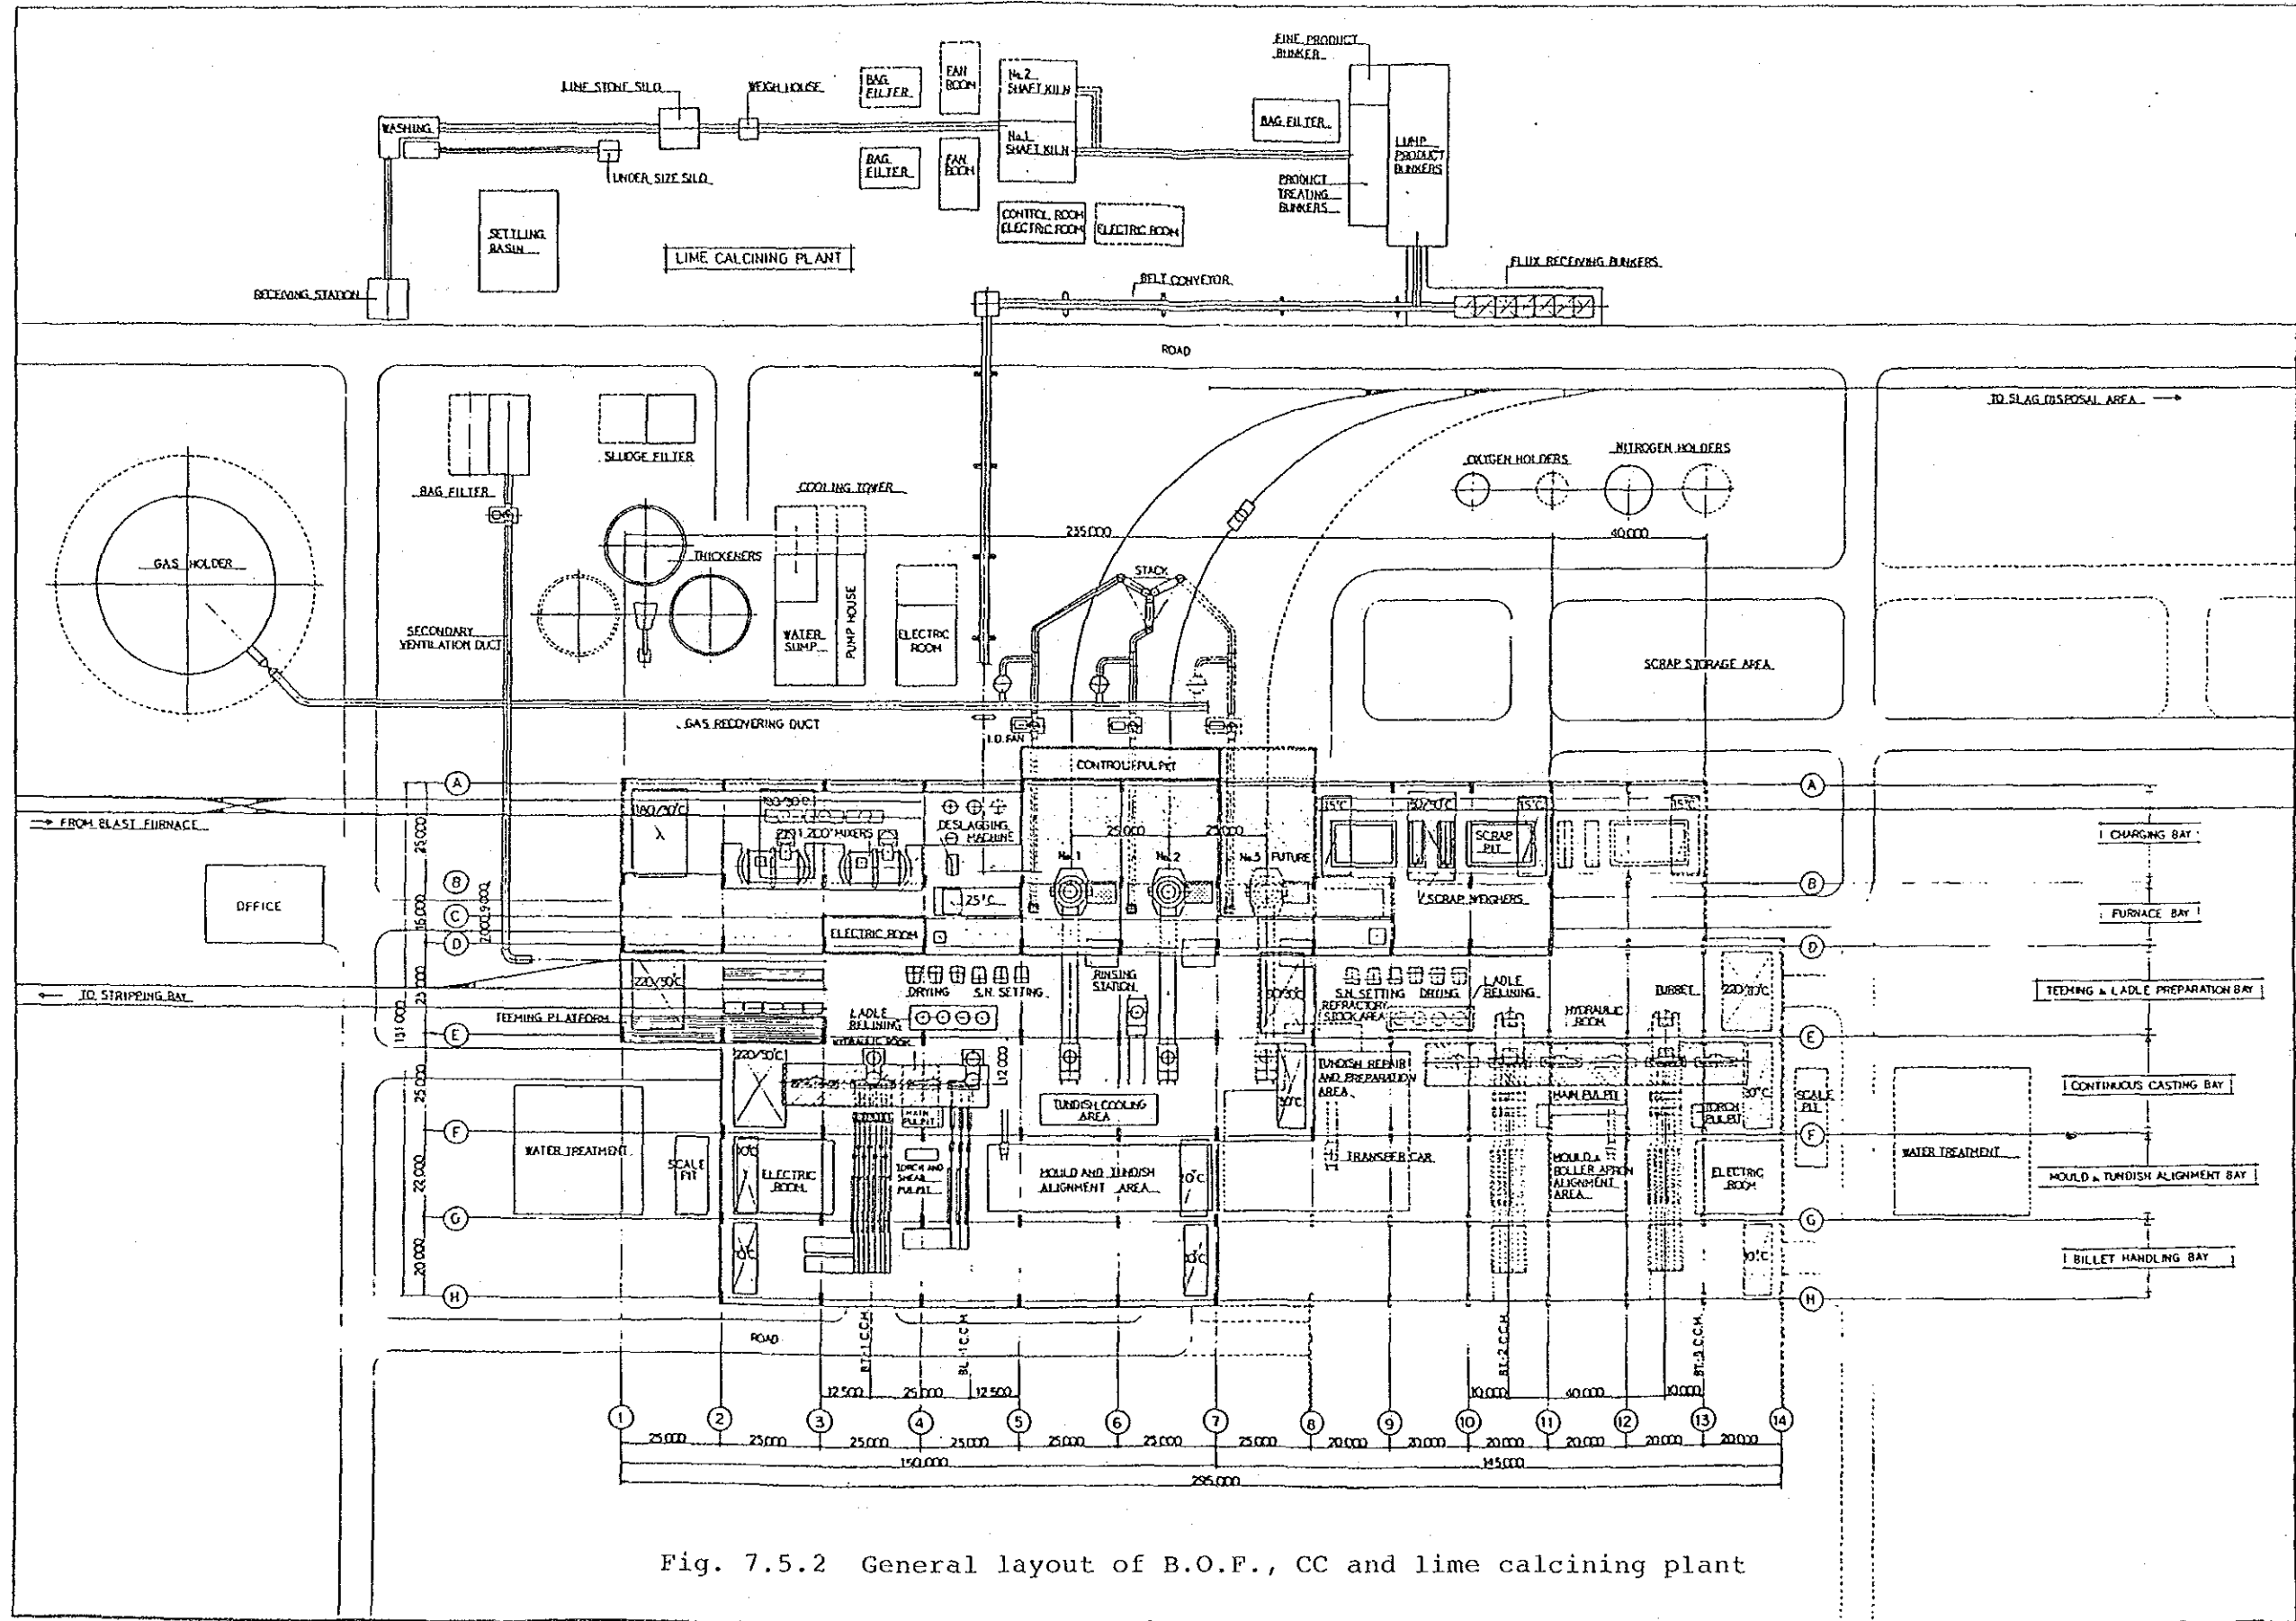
General layout of B.O.F., CC and lime calcining plant
